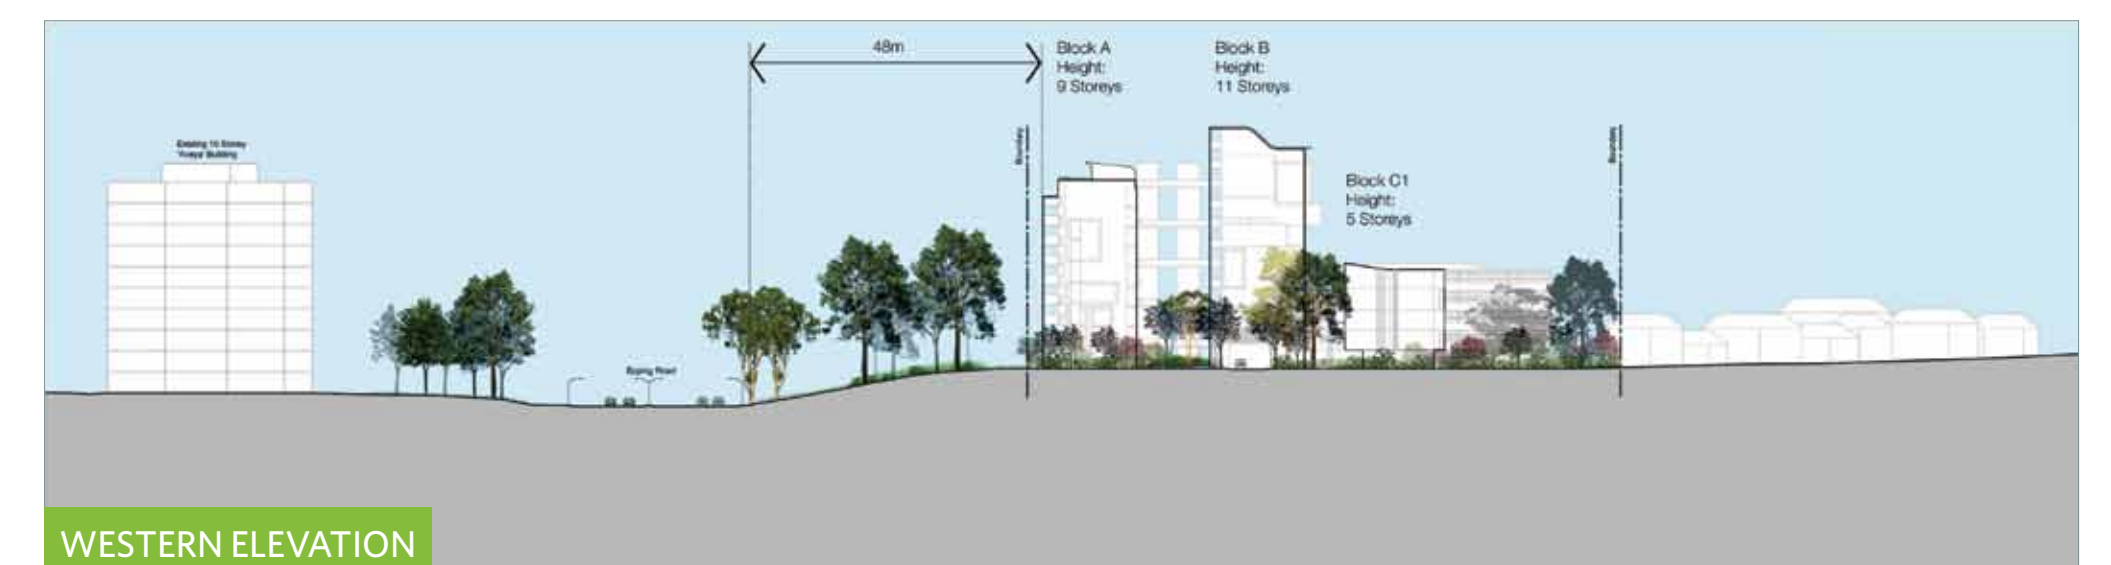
PLAN VIEW OF SITE SECTION AND ELEVATIONS
